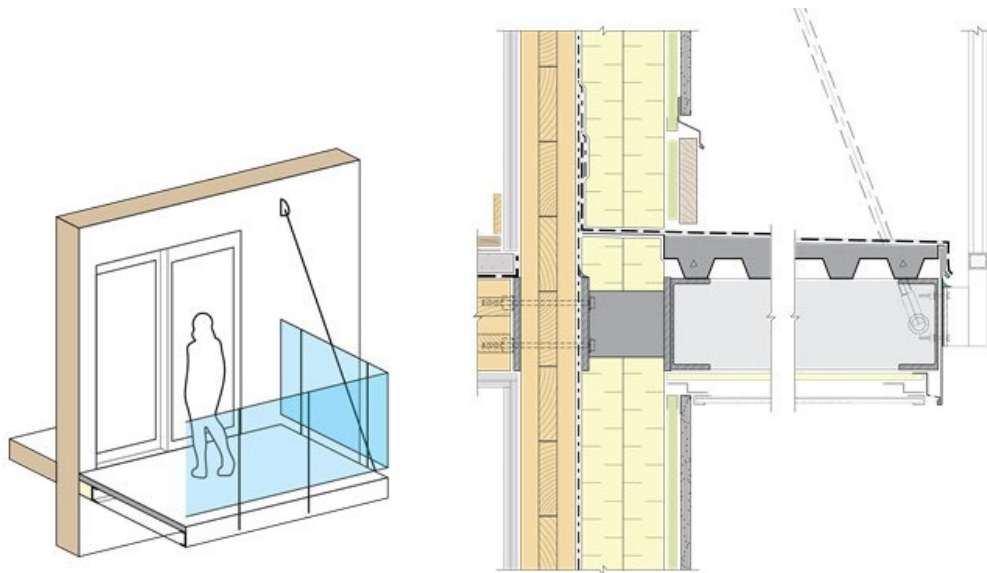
Schematic and detail of the face-mounted balcony approach for mass timber buildings.
